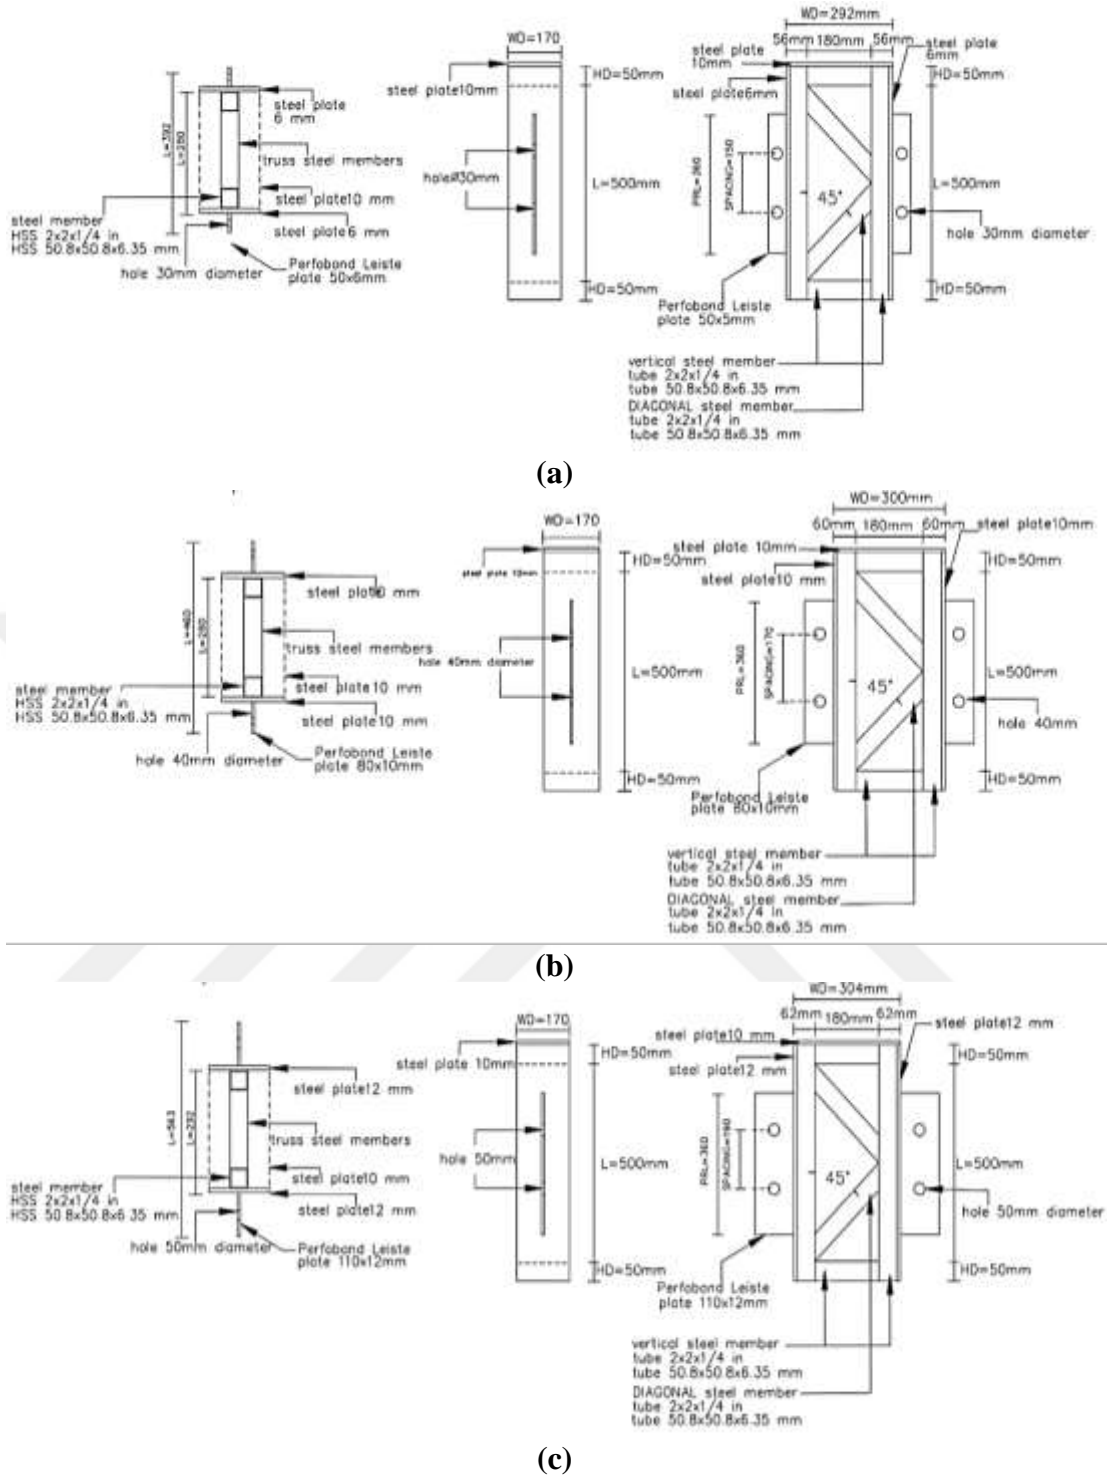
Perforated Ribs Specimens' Dimensions for Push Out Test (a) (PRP1) Sample, (b) (PRP2) Sample, (c) (PRP3) Sample
